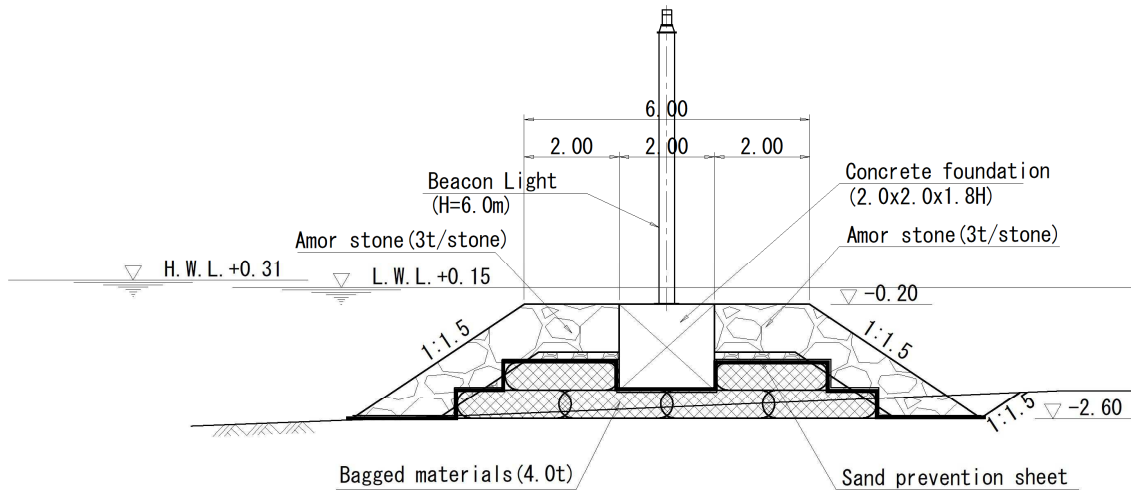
(7) Cross section drawing at tip of submerged breakwater (completed)
